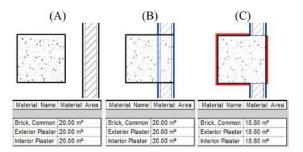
(A) Wall material area when the wall is outside the column. (B) Wall material area when drawing the wall through the column. (C) Wall material area decreased after using the Join Geometry tool. The red line shows the areas of the finish layers that are missing from the model.
